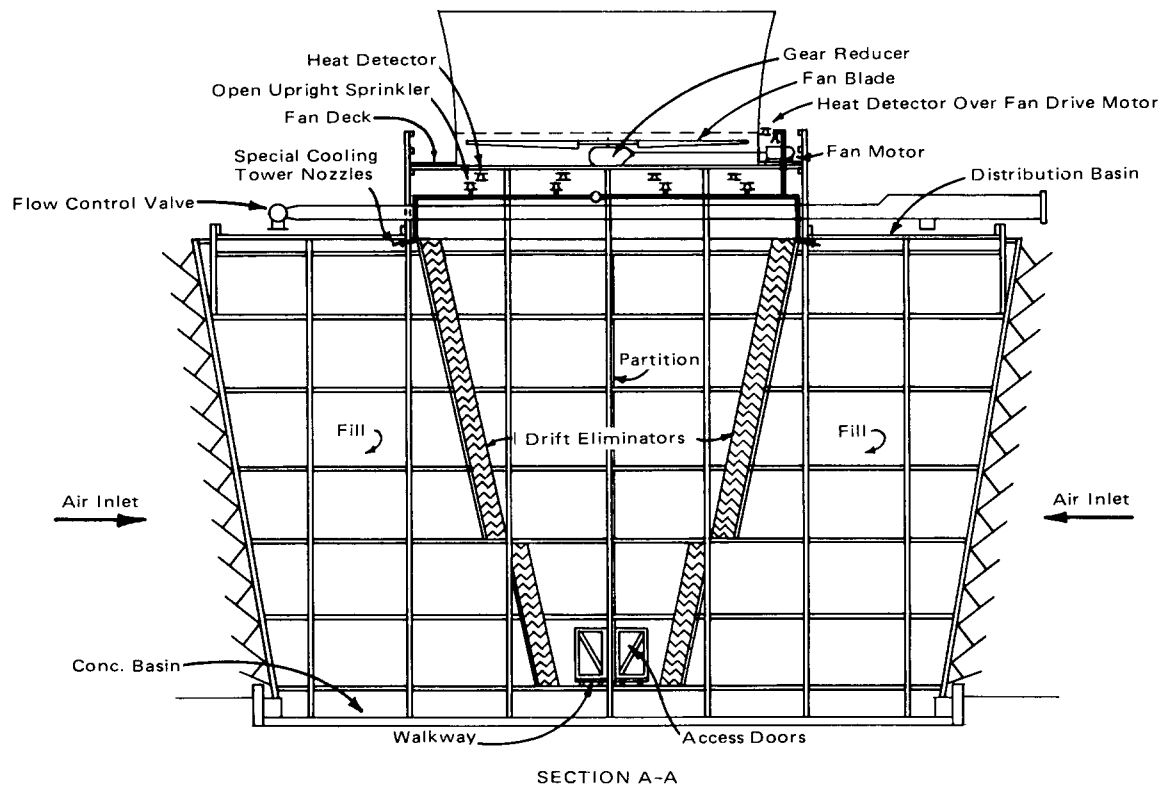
(b) Typical deluge fire protection arrangement for crossflow towers.
